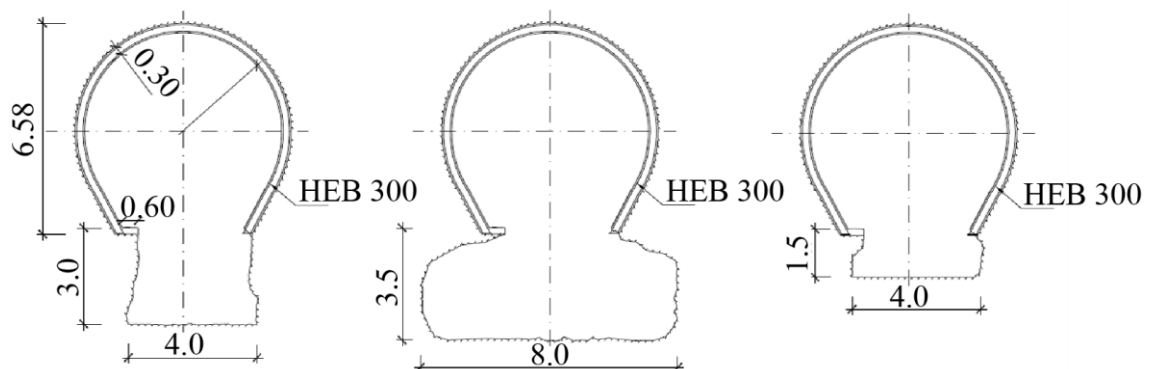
Typical tunnel cross sections before rehabilitation works (2011)
